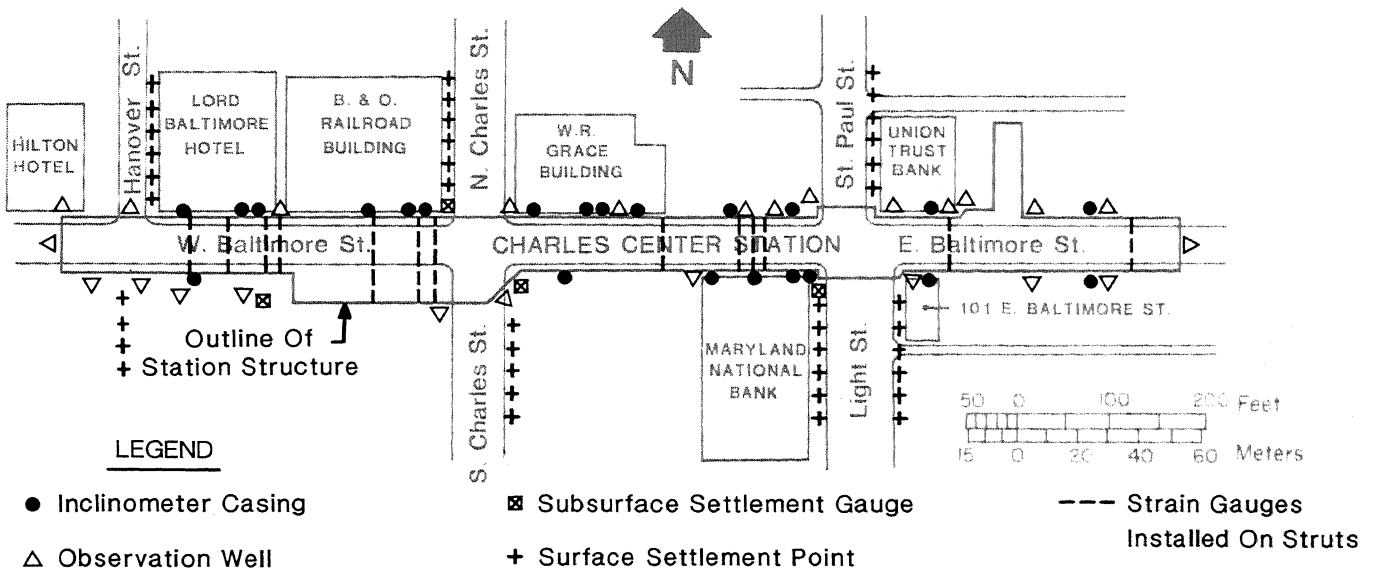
Charles Center Station Site Plan showing locations of instrumentation.
